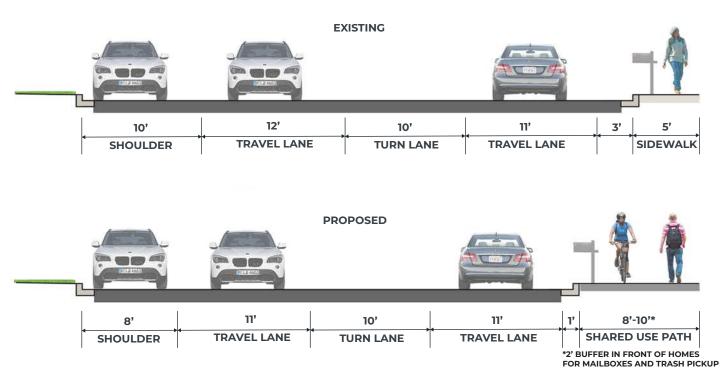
Existing roadway layout and proposed roadway adjustments to include a shared use path on McKennans Church Road from Duncan Road to Millcreek Road.
